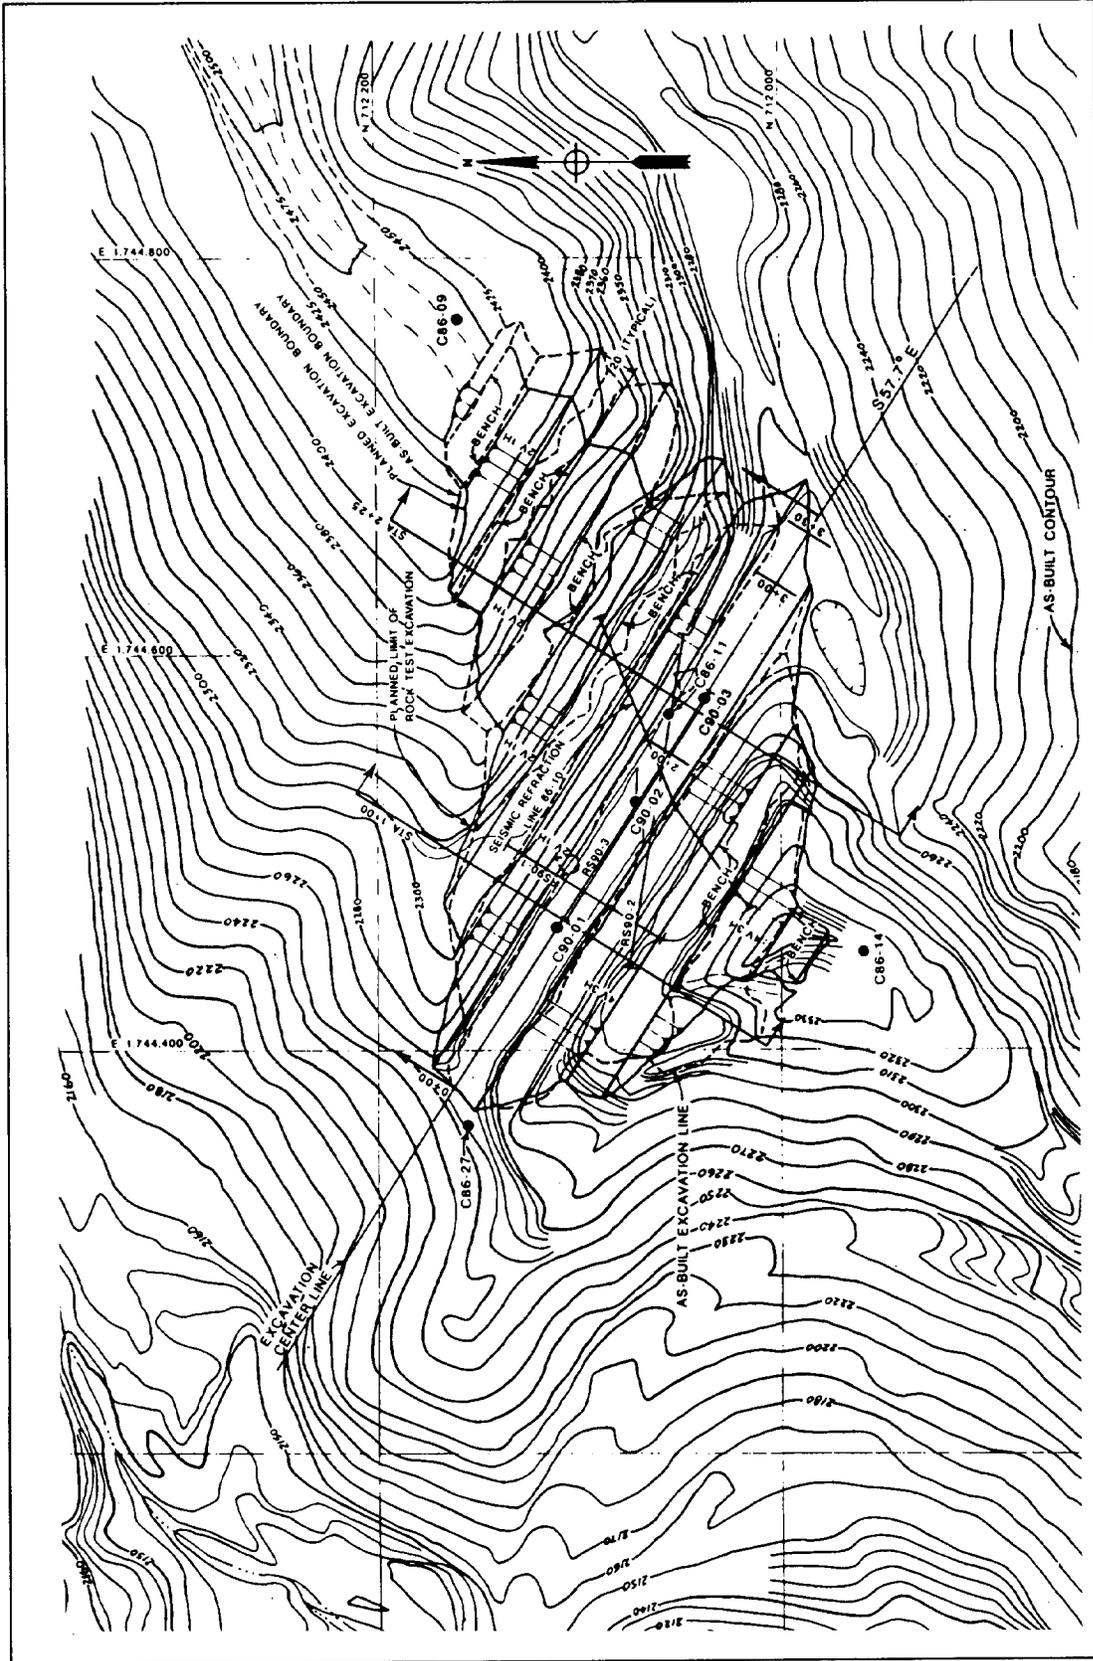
Example of a single test quarry layout showing bench and slope configurations, Seven Oaks Dam (after U.S. Army Engineer District, Los Angeles 1992)
